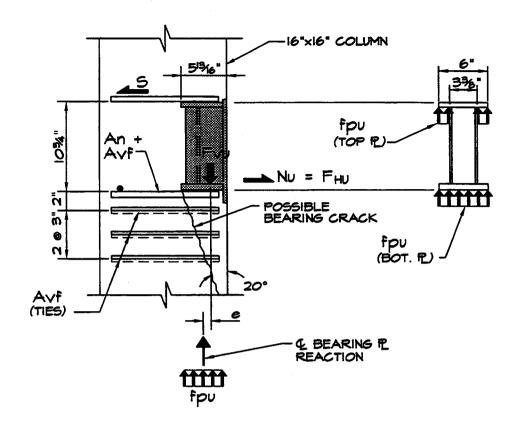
Example Column Reinforcement at BSF 200/50 Connection
